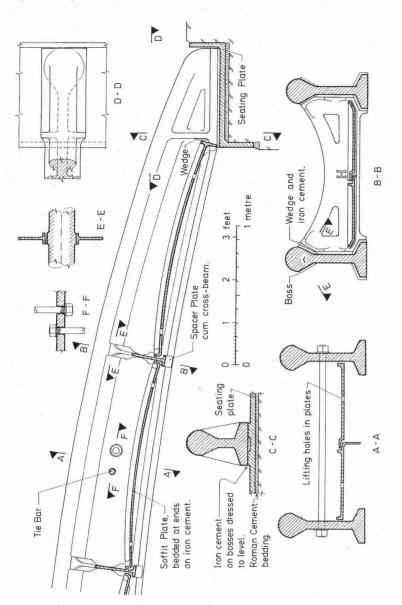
Ironwork of the main span: measured details made from observations on site. (Malcolm Tucker)
